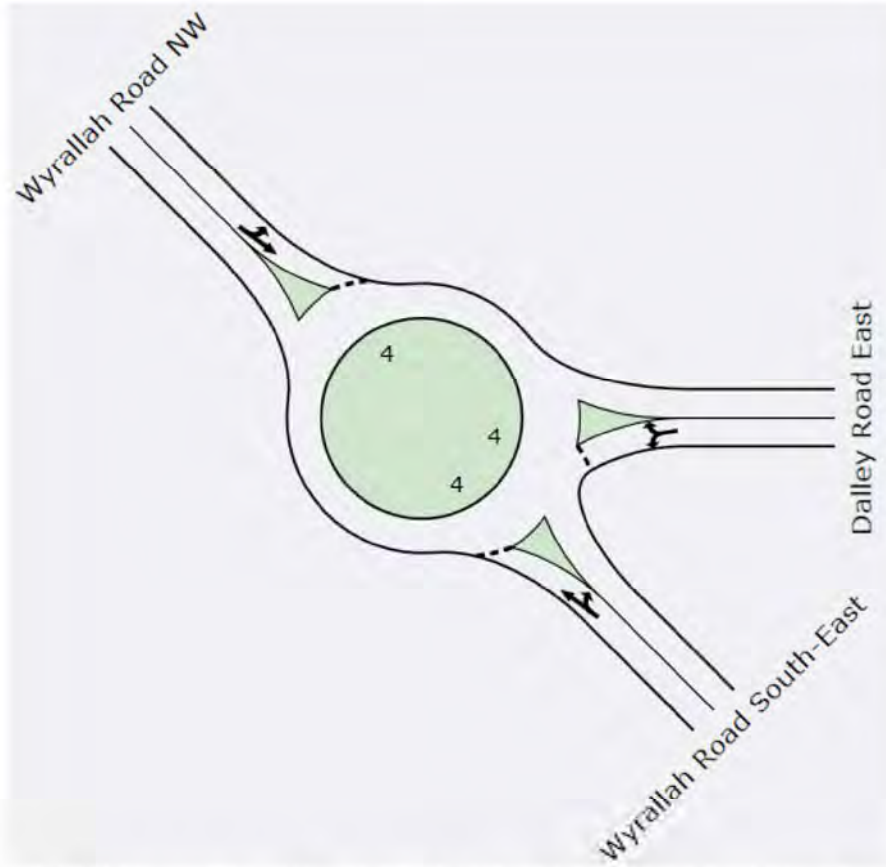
SIDRA Representation of Planned Upgrade to Wyrallah Road / Dalley Street Intersection
